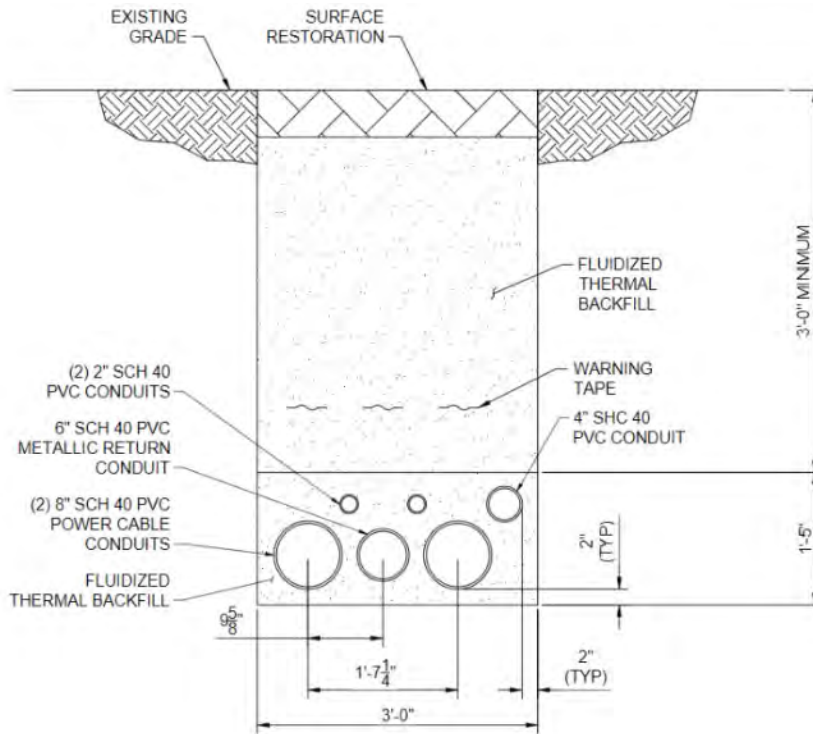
Typical Installation Configuration of Underground Onshore Transmission Circuit
